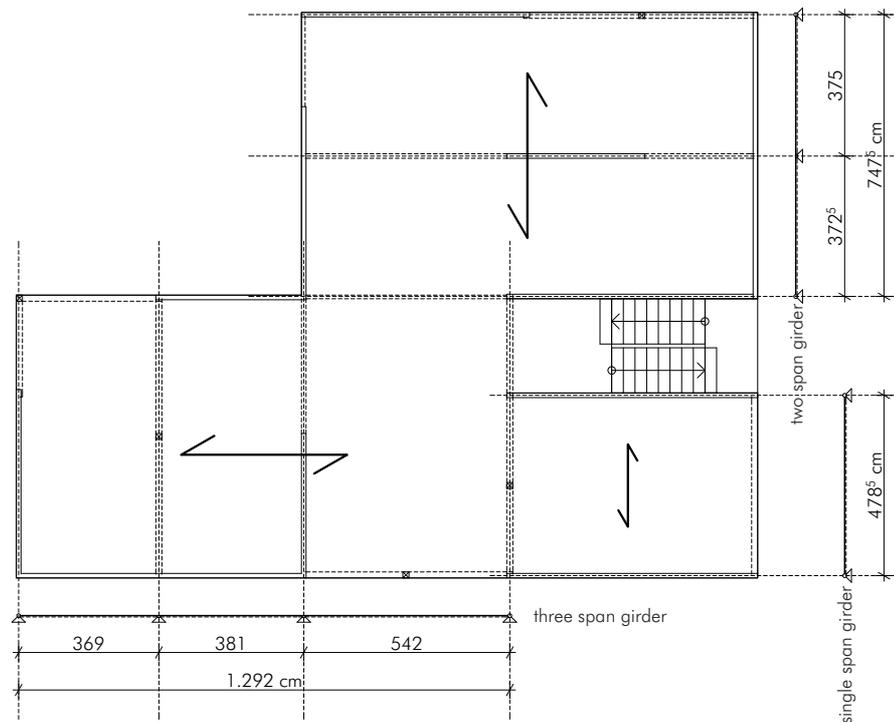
possible approach to categorise the ceiling elements of a single span girder system in plan
